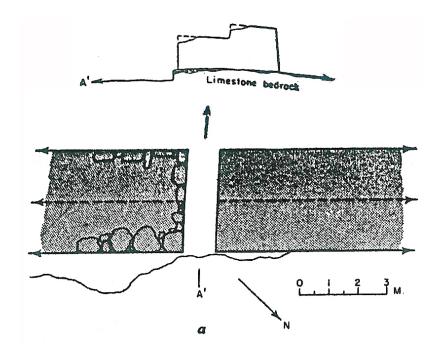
Plan and cross section drawings of Minor Gate A (modified after Shook 1952:Figure 3a).
